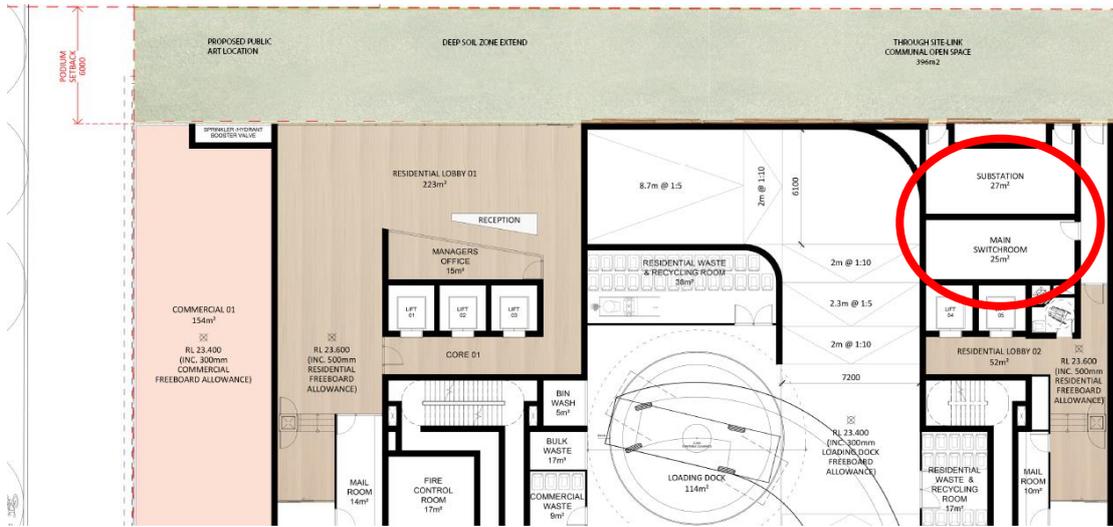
The amended indicative ground floor plan presented to the competitive design process selection panel, with the proposed location of the through-site link in green and the substation circled in red
